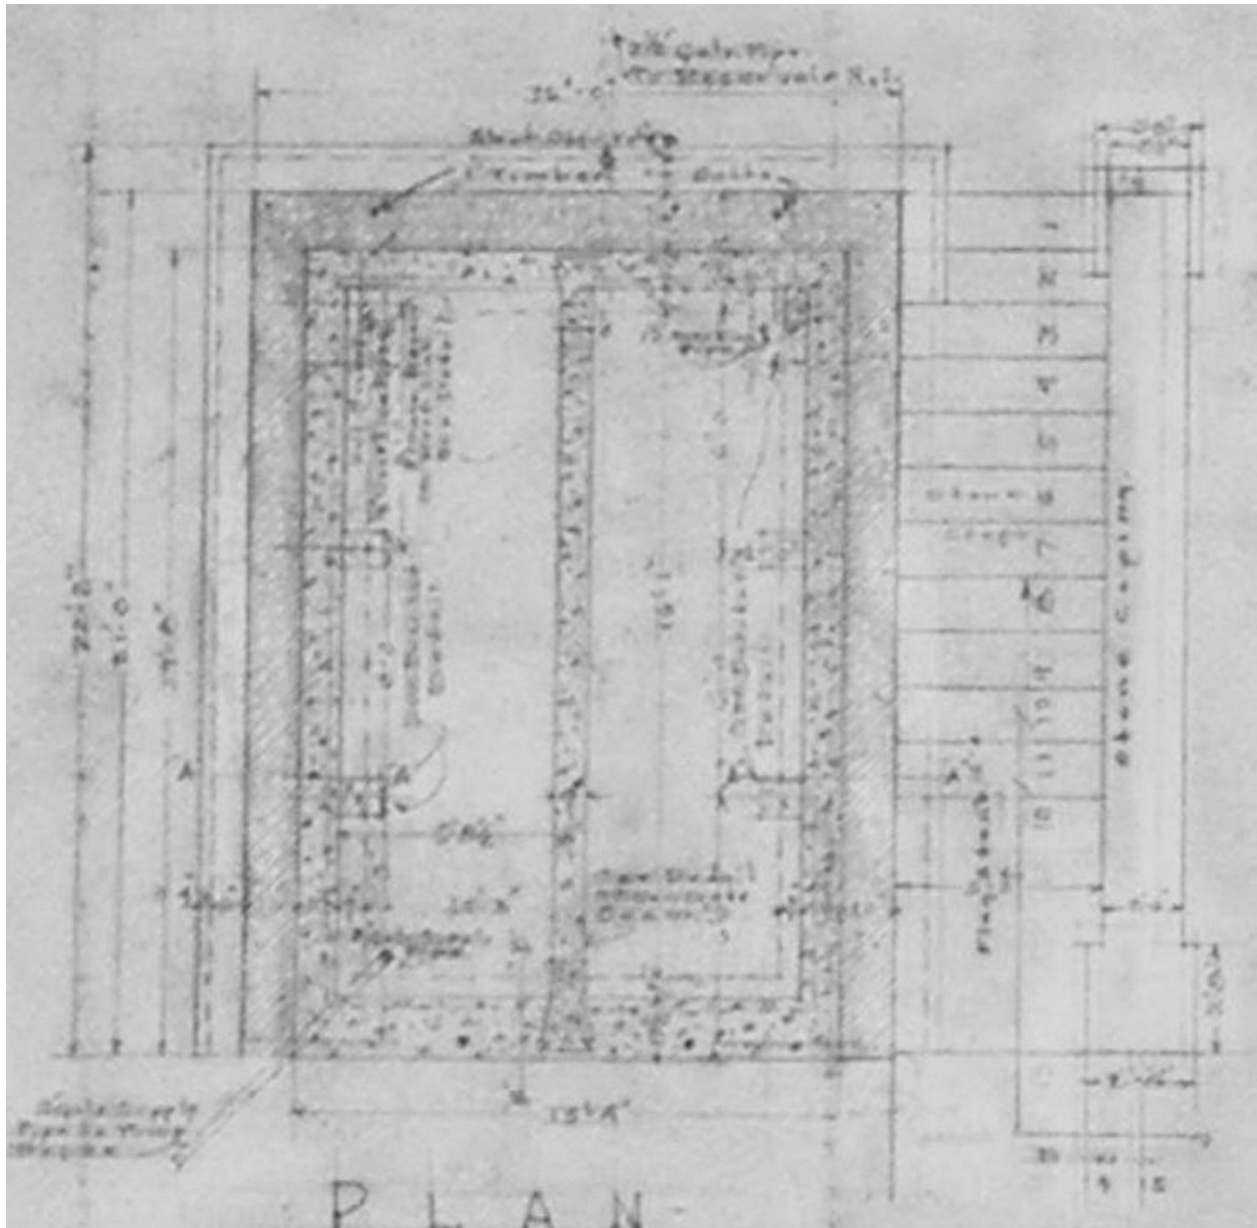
Plan drawing of the water reservoir at the east pavilion of the Bridge complex. (Source: Caldwell Archives at the Dubuque Museum of Art)
